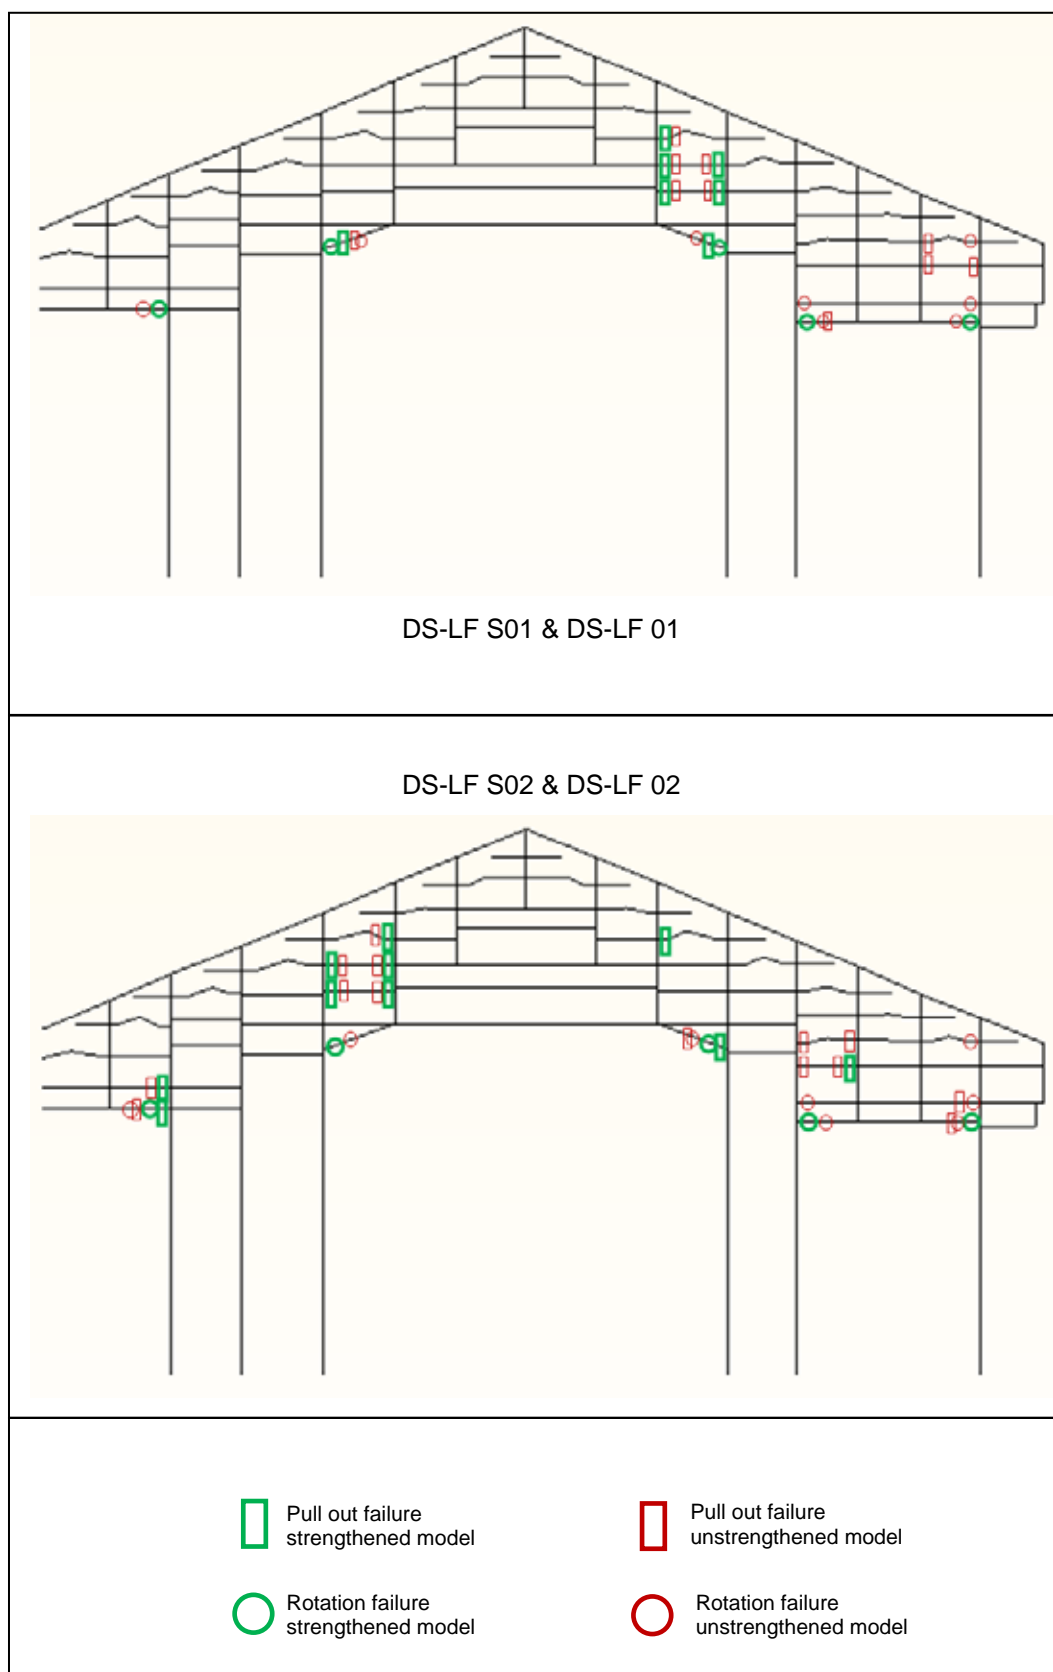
Joint failures of Dou-Shan frame before and after strengthening
